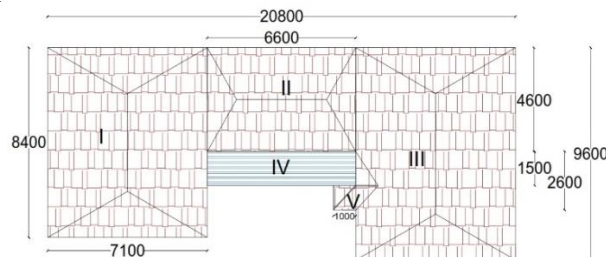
5 Layout of U-Shaped Roof of Arman Dormitory (Building D)
